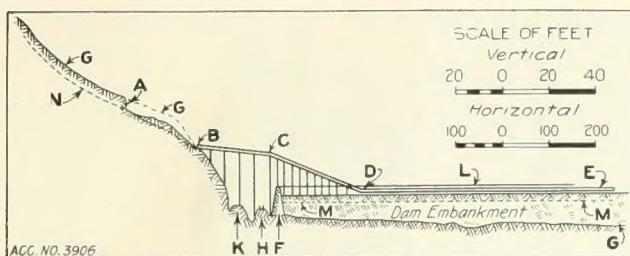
PROFILE OF HILLSIDE BORROW PIT LAYOUT
